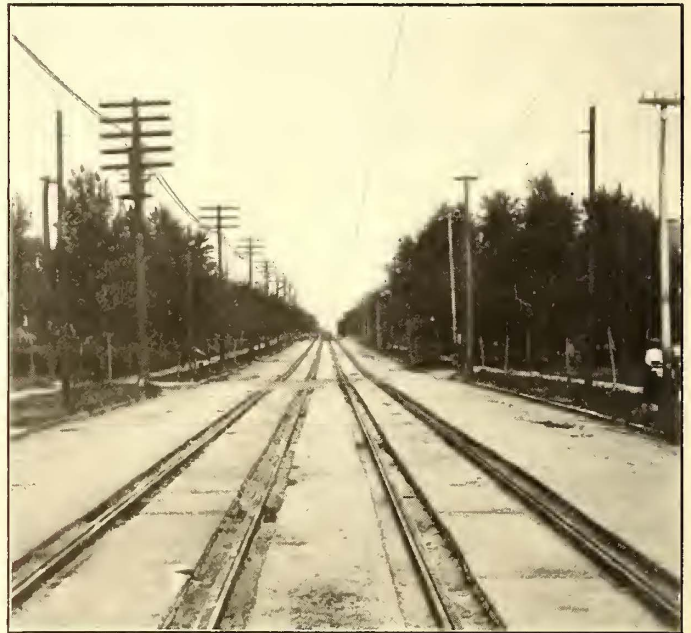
TRENCHES FOR BLOCKS IN ASPHALT PAVING
